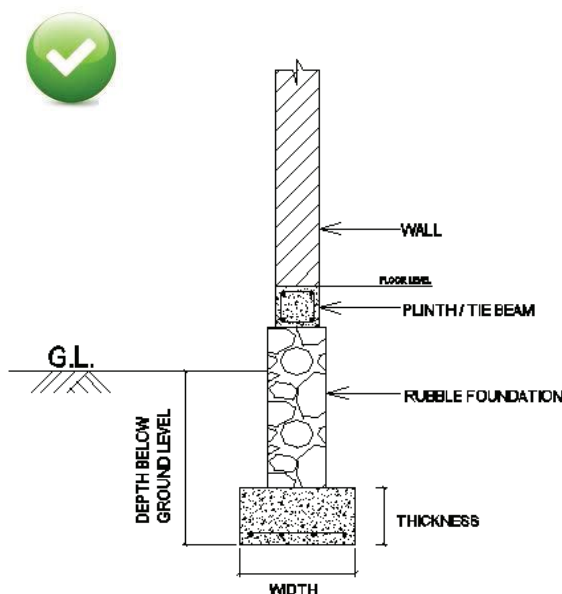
Typical Wall Foundation Section (Rubble Masonry)
